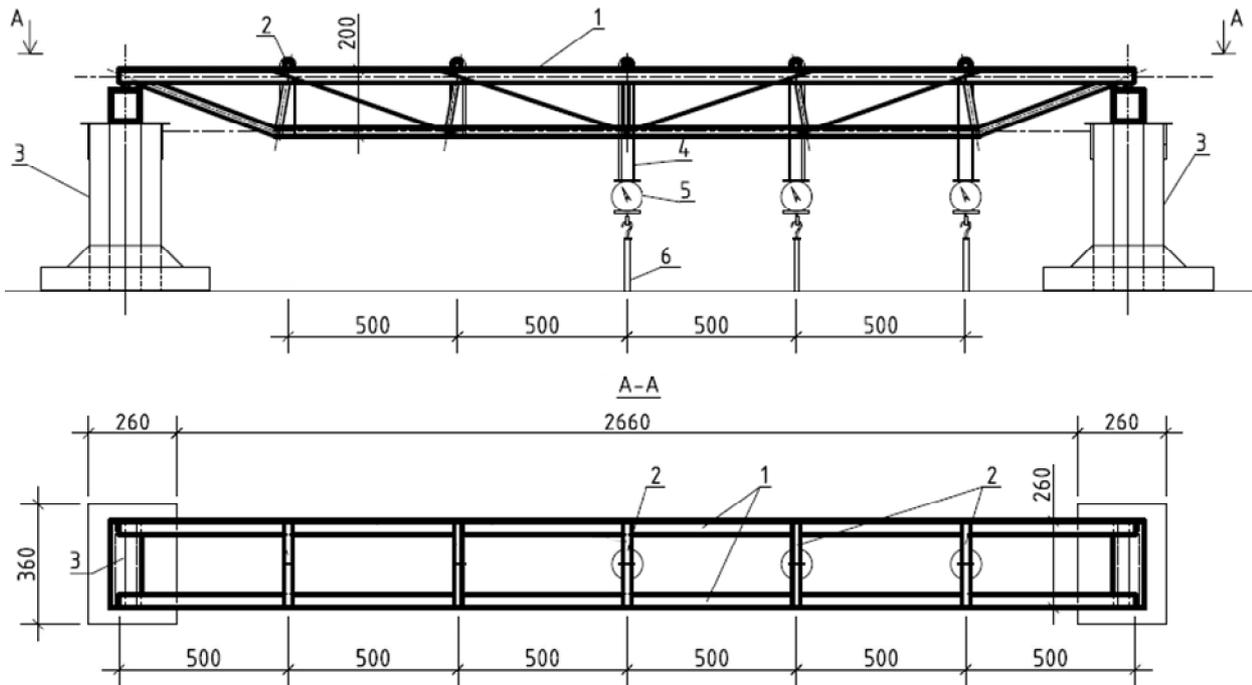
Installation for steel trusses stress-test: 1 - sample; 2 - traverse; 3 - support risers; 4 - traction; 5 - dynamometer; 6 - hydraulic jack
